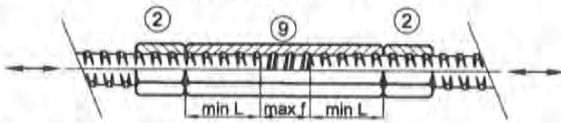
Coupler, standard; thread coupler Ø18 - 43
